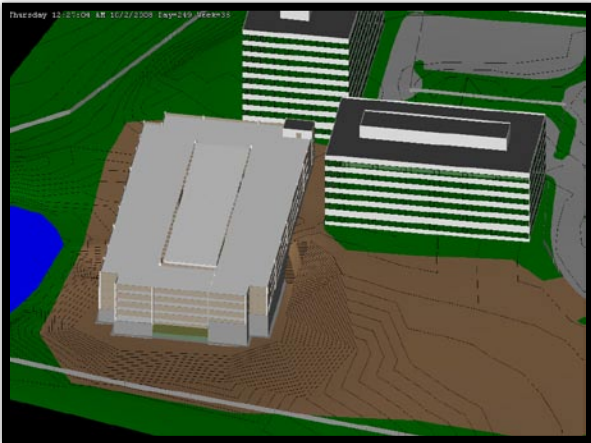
Phase 2 Footing and Foundation Wall Construction
